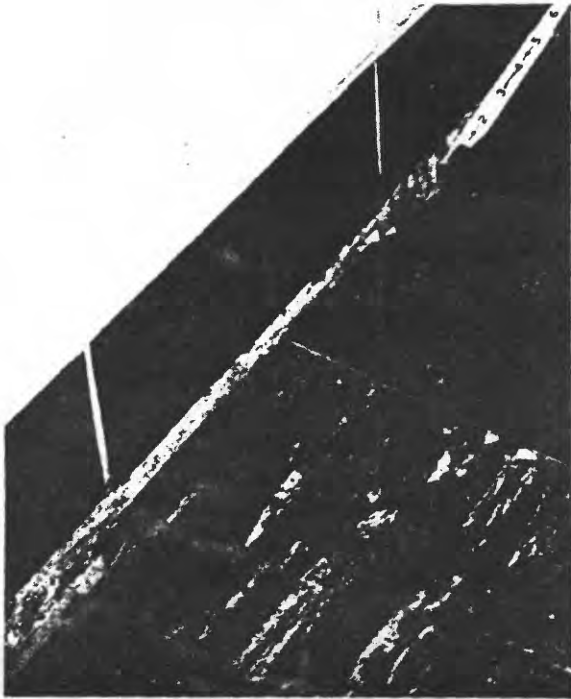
Separation of wall and floor, possibly exacerbated by concrete shrinkage.
